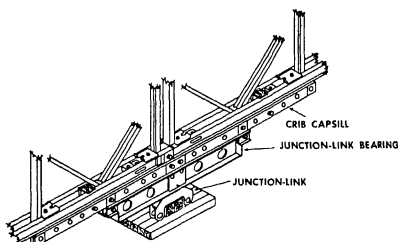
Rocker bearing to support three panel support points made from crib capsill, inverted junction-link bearing, and junction link.
